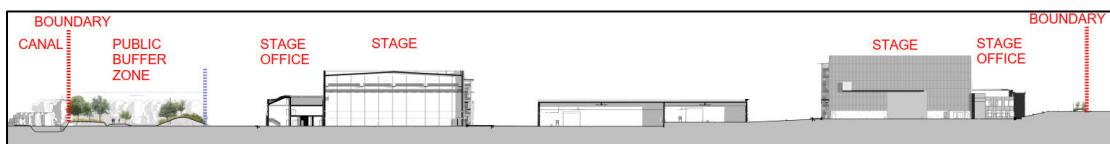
North-South cross section through site showing transition of height from Stage building to boundaries (Source MCA Architects).
